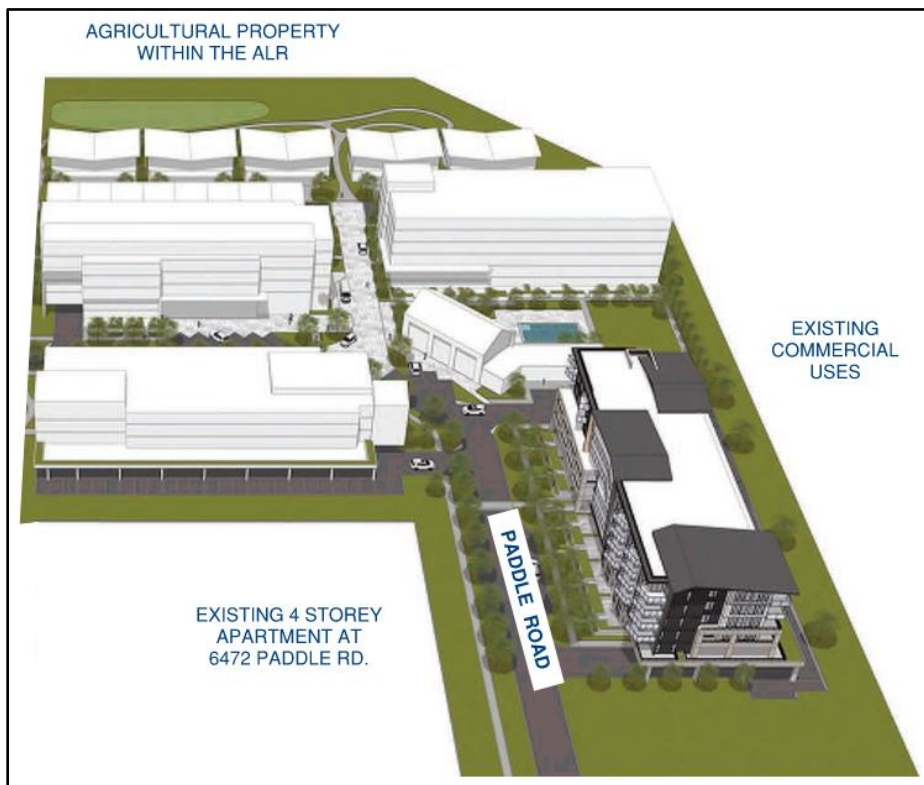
A rendering of the project provides an overview of 4 potential apartment buildings located at the north end of Paddle Road. The development could include a private amenity building. Only one apartment is shown as it could look like should this zoning amendment, and subsequent development permits, be approved.
